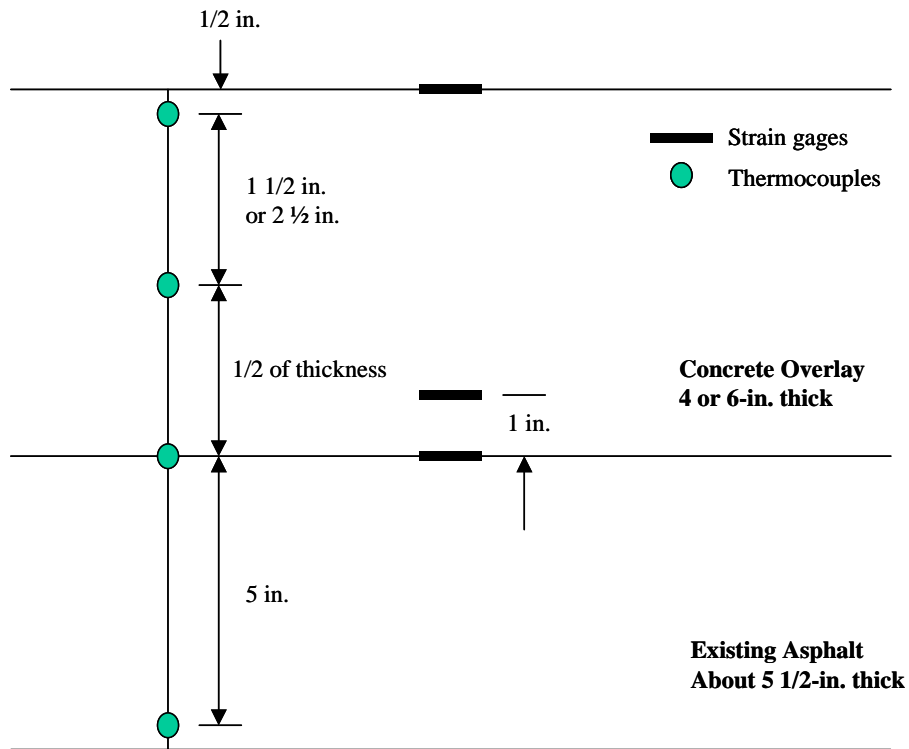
Typical Strain Gage and Thermocouple Layout – Section View
